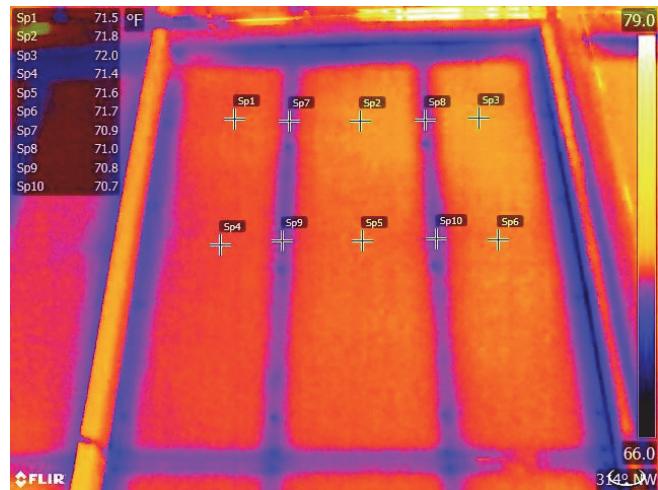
Drywall surface temperatures of 2×4 framed wall with continuous exterior R-5 fibrous insulation.
